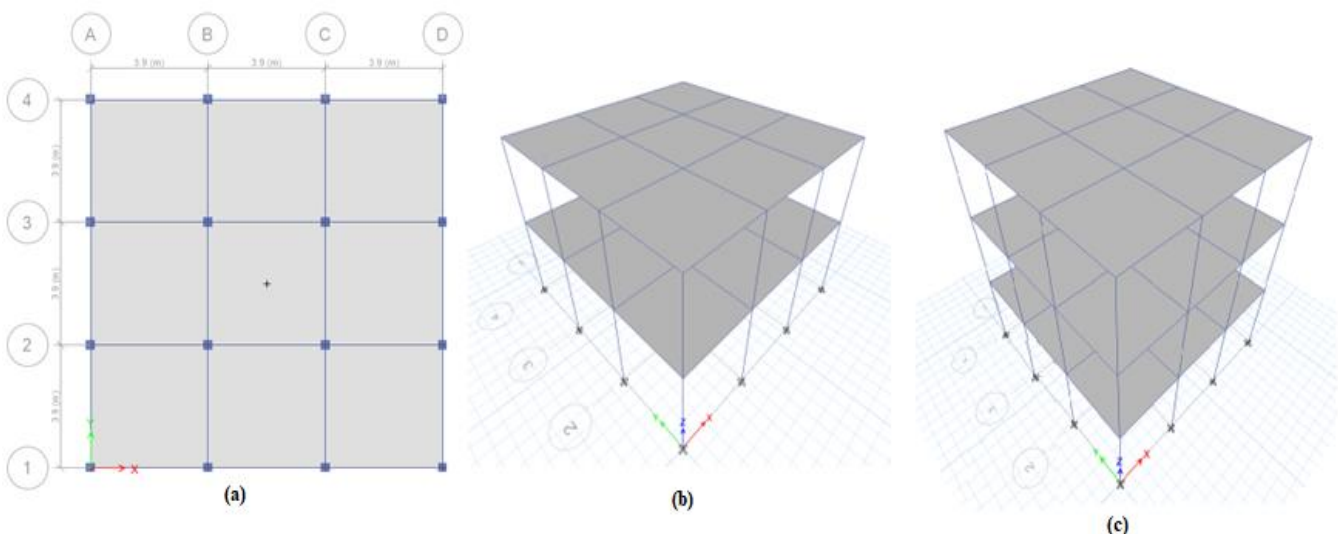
Building Model, (a) Plan, (b) 2-Storey and (c) 3-Storey
